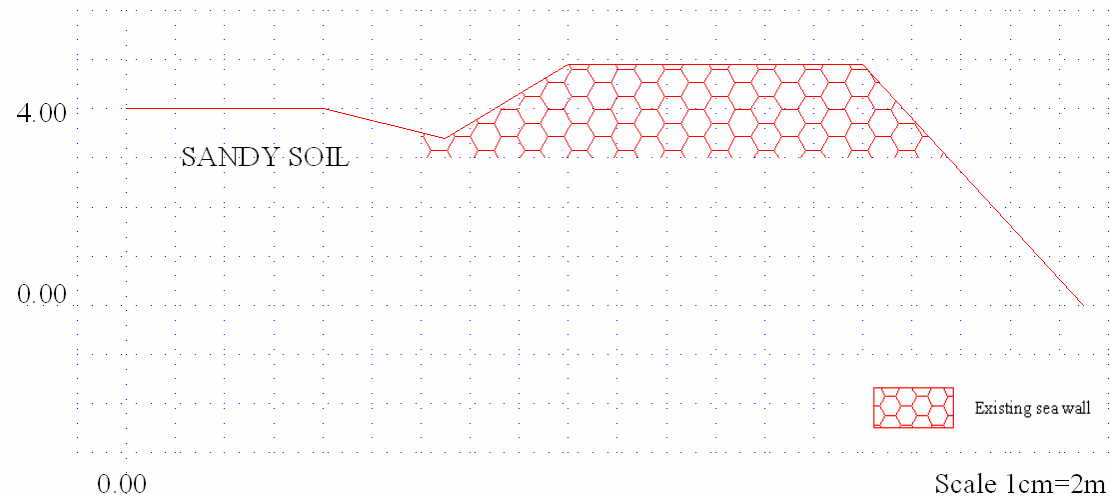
Cross-section of the existing damaged seawall (as per KID) at Jayanthi Colony
